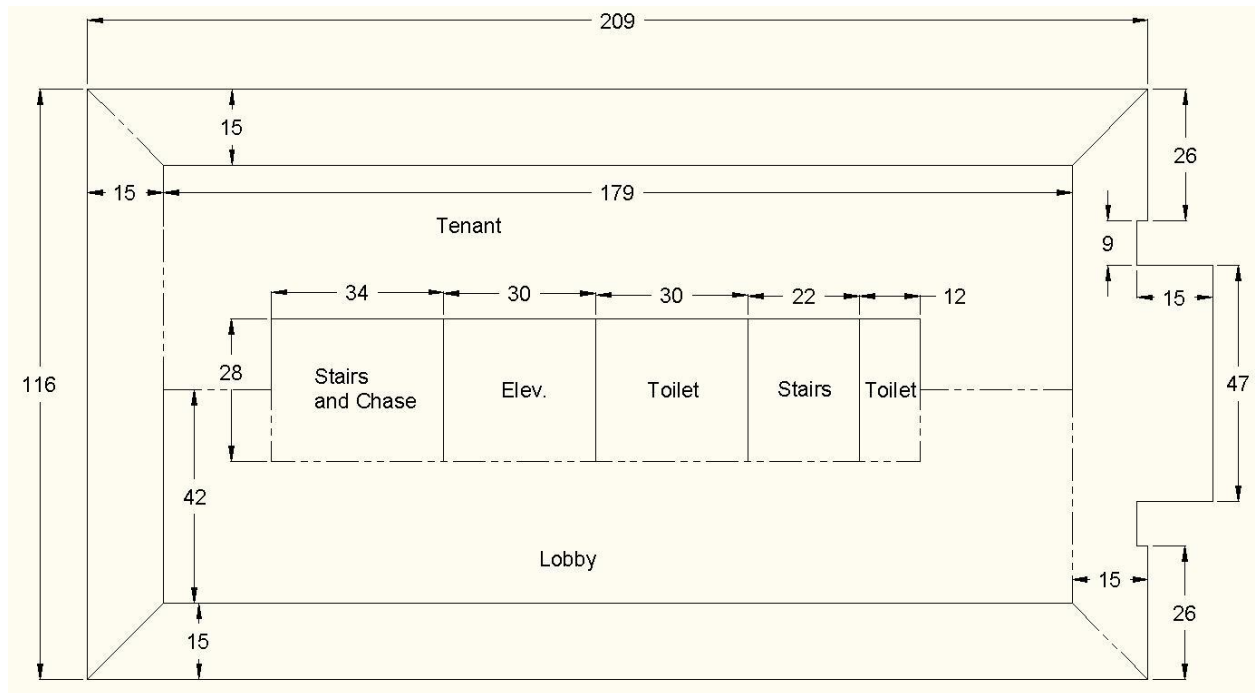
Ground floor plan of core and perimeter zones (Case Study IV).
